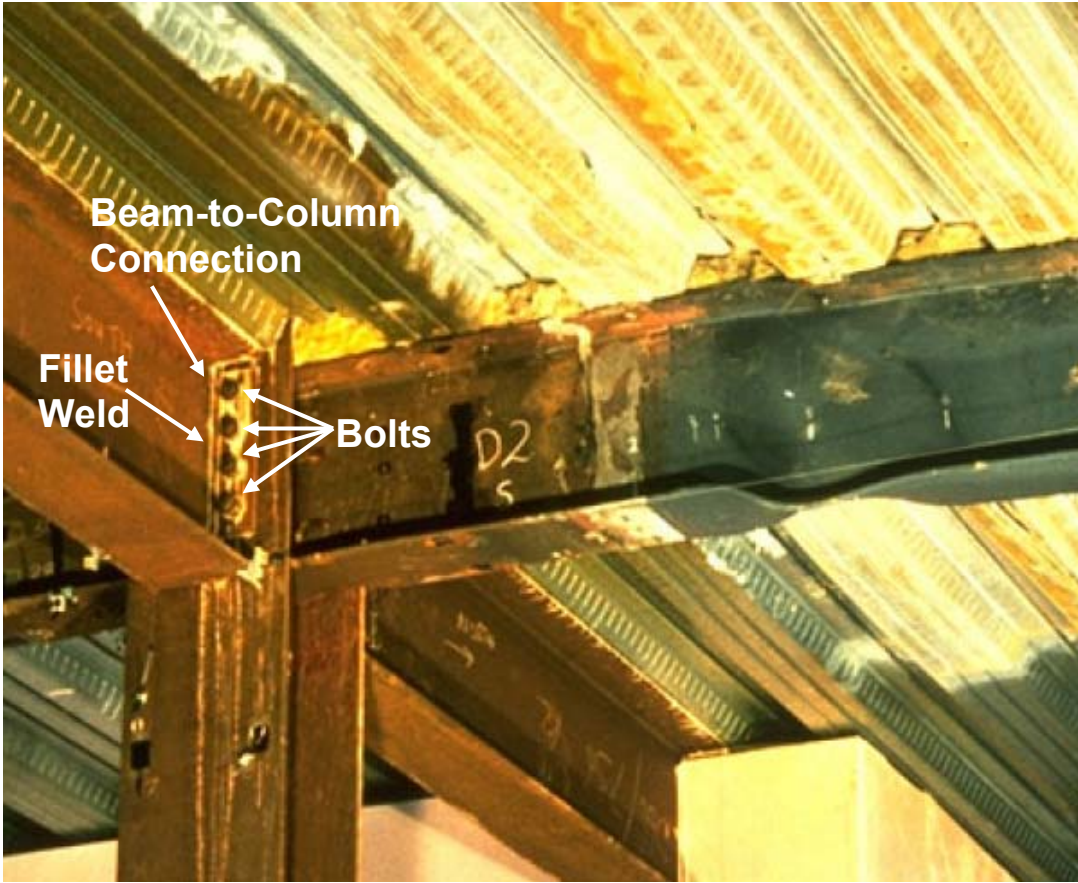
Photograph of typical beam-to-column connection used in the Cardington Fire Tests (Newman, 2000)
